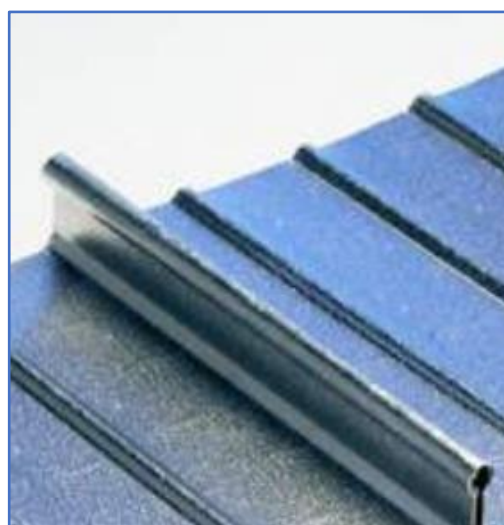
Aluminium standing seam sheet with stucco embossed finish
